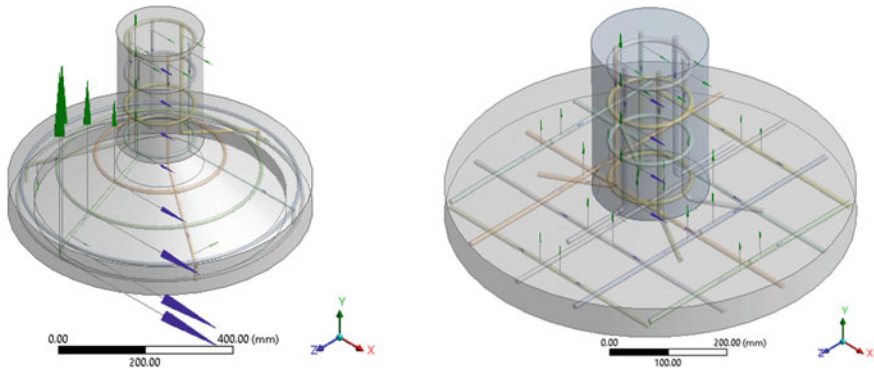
a Finite element model of reinforced conical shell foundation. b Finite element model of reinforced circular flat foundation
